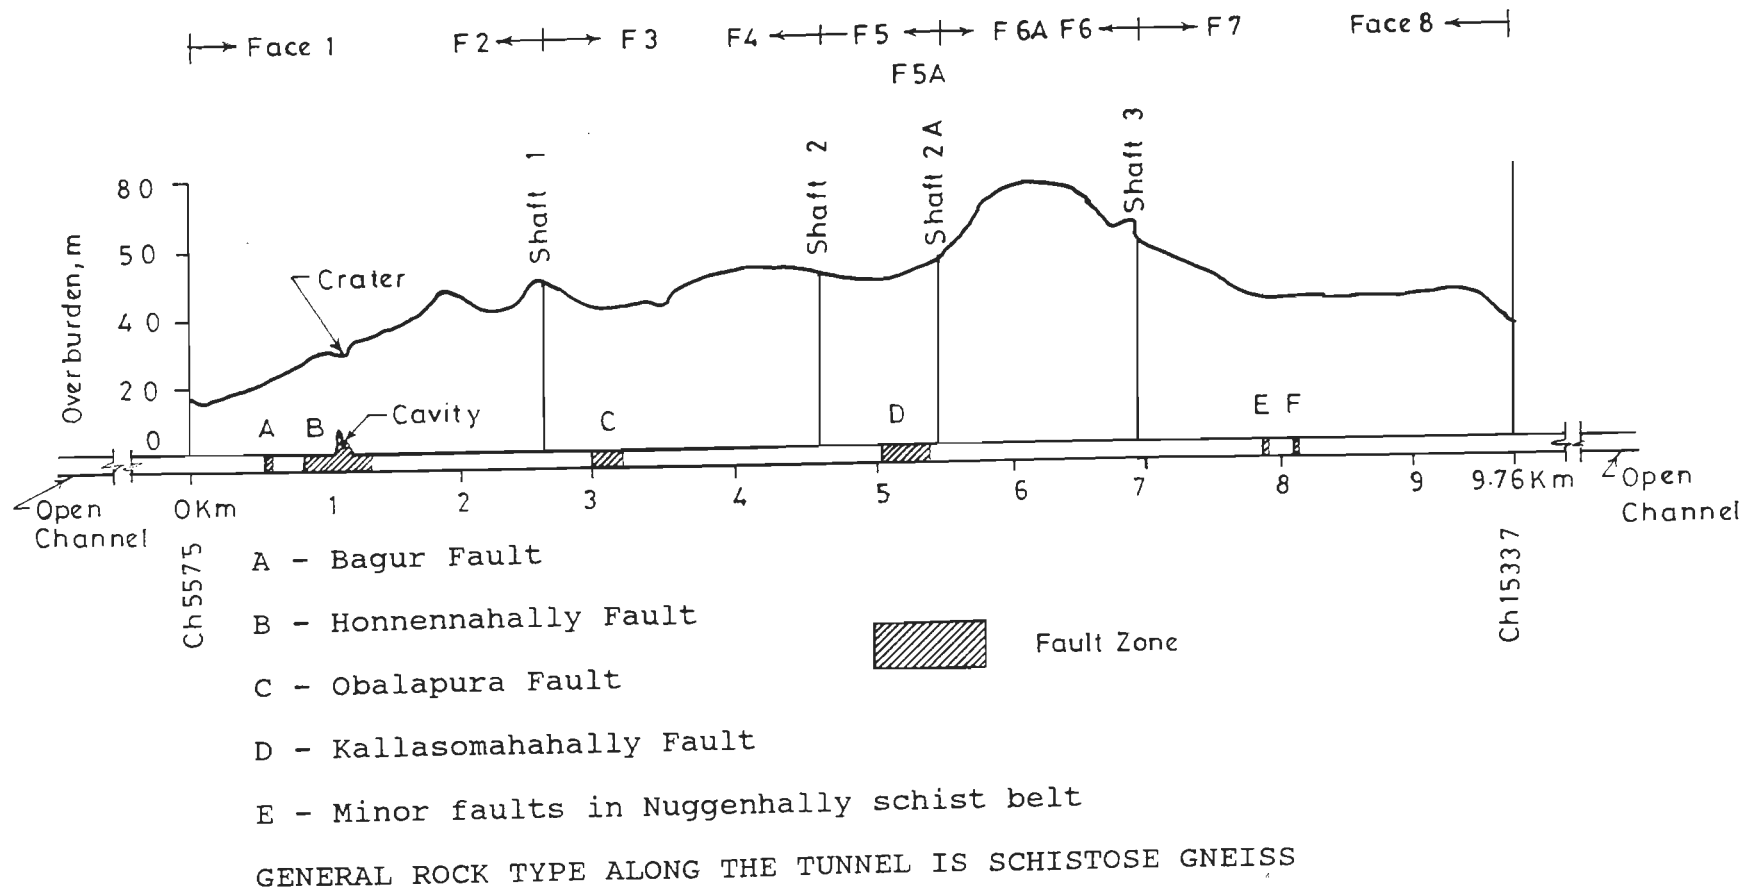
Longitudinal Section of Bagur-Navile Tunnel
